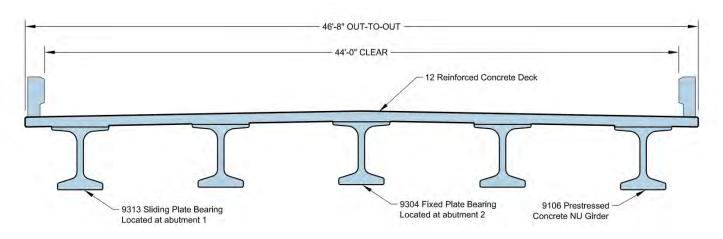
EI.24.5- 3: Cross section view of prestressed concrete beam bridge superstructure
